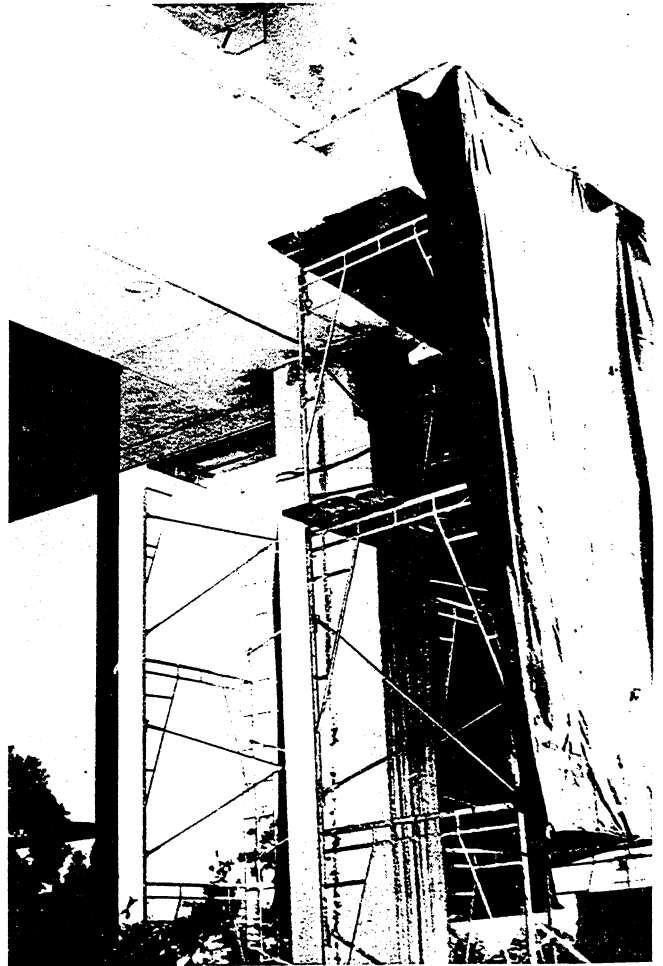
Southeast corner column at second floor (After Blume, 1973).
